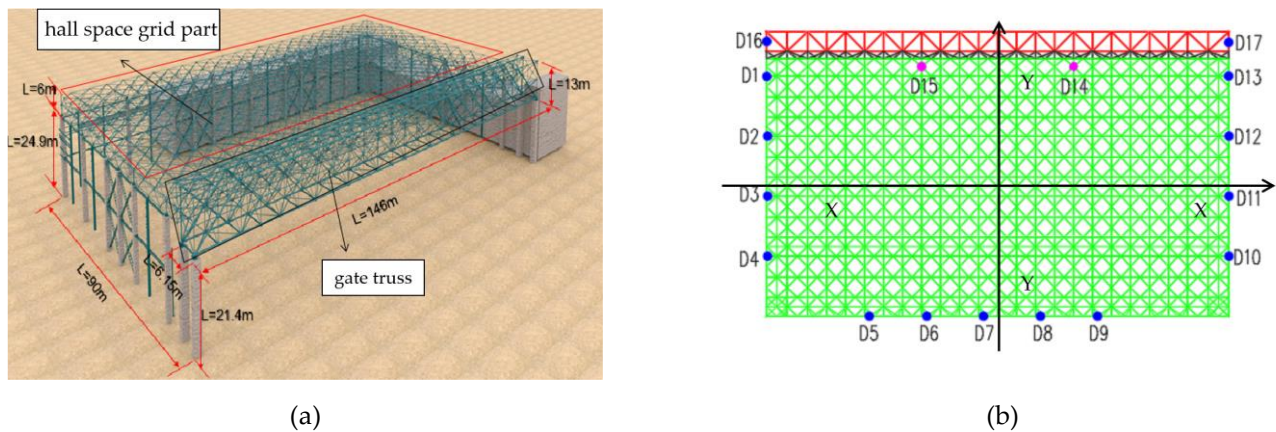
Structural parameter and the spatial grid lifting point layout: (a) grid structure in place; (b) the spatial grid lifting point layout.
